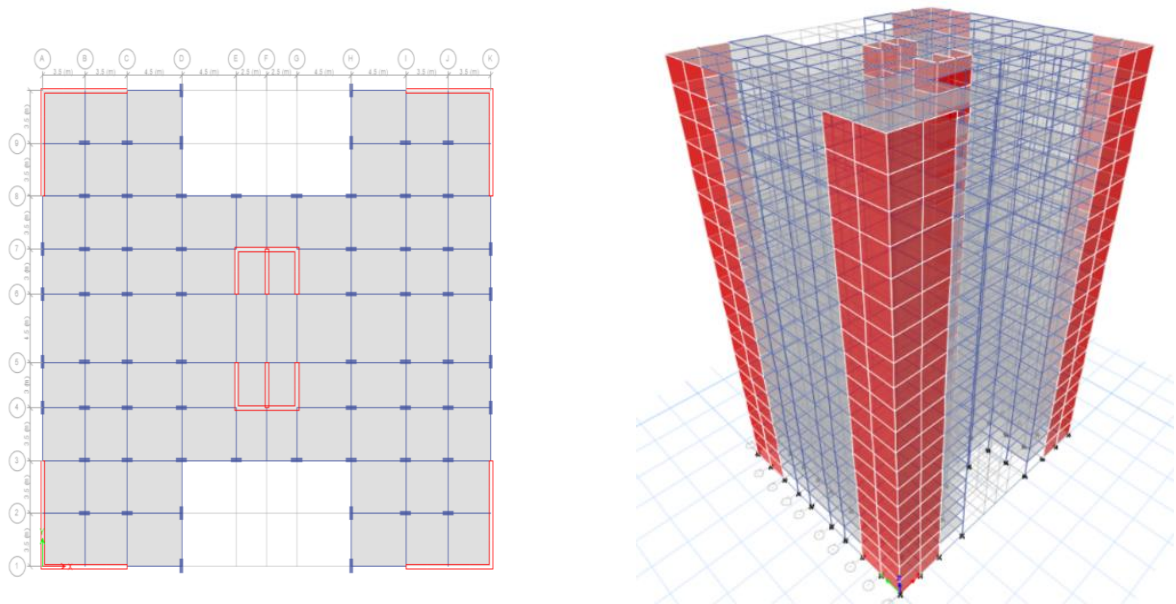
Plan And 3D View of H Shaped Model with Shear Walls
